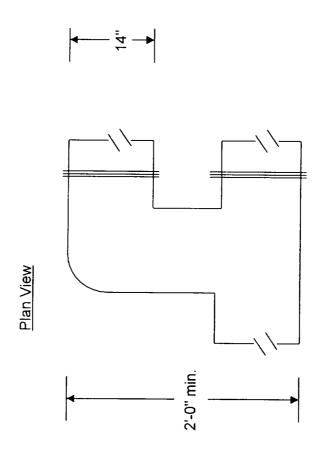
Detail B - Mixing Chamber, Scale 1/16 in. = 1 in.
